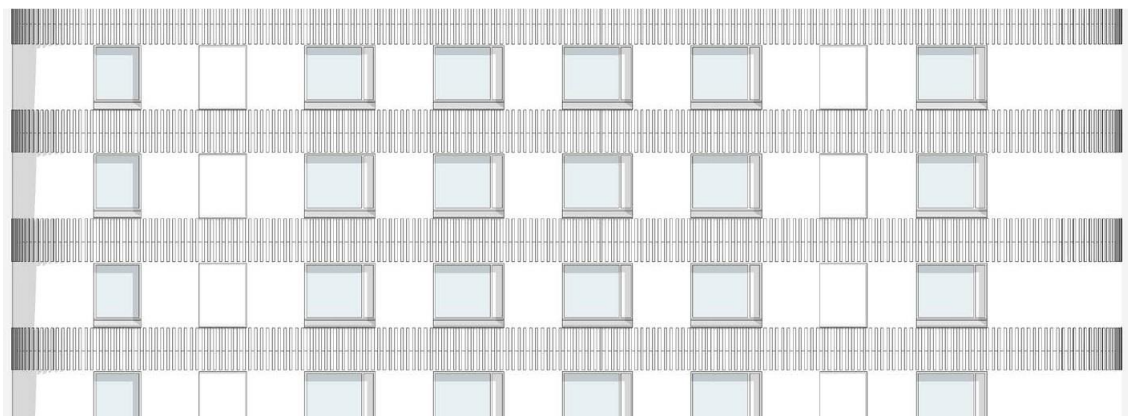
(above): Cropped view of the proposal's Tiverton Street elevation, showing the regular spacing of the bedroom windows, providing opportunities for staggered windows on any redevelopment opposite at the S.A.H site.
